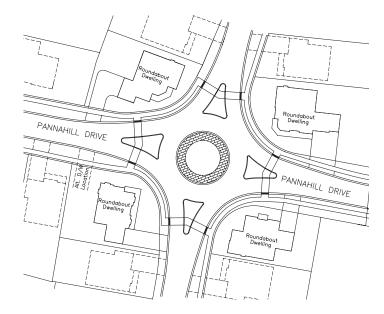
Conceptual Plan of Roundabout Dwellings
